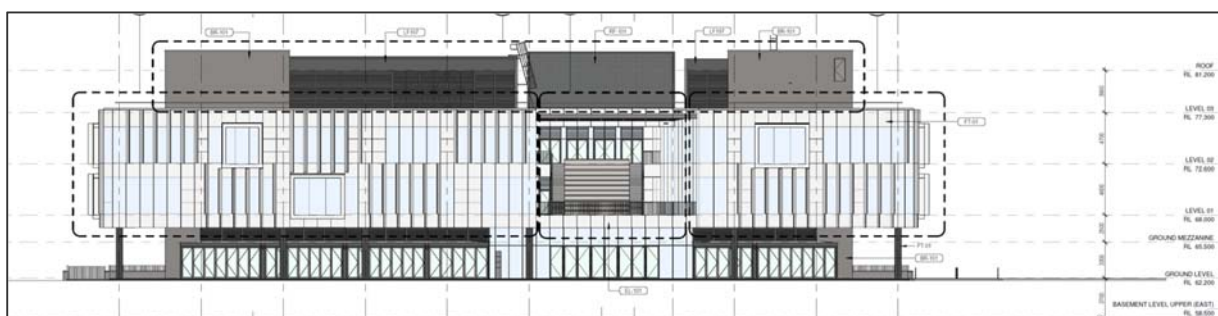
| Student Hub Southern Elevation (Source: RtS)
